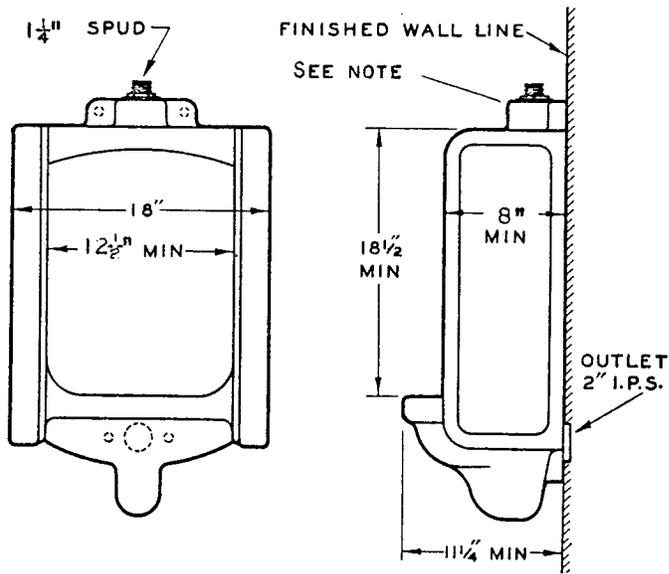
WALL-HANGING BLOWOUT URINAL. (PAR. 4.3.1.)
